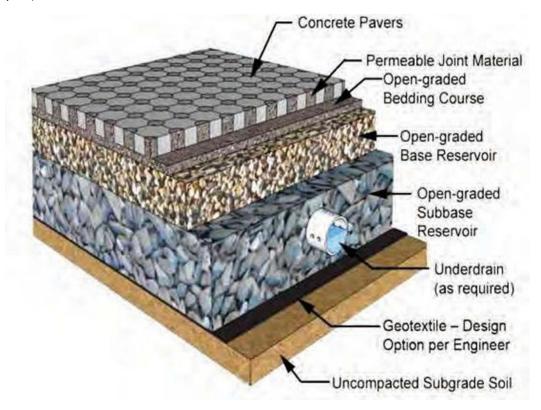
Cross-section of permeable pavement (source: ICPI).
